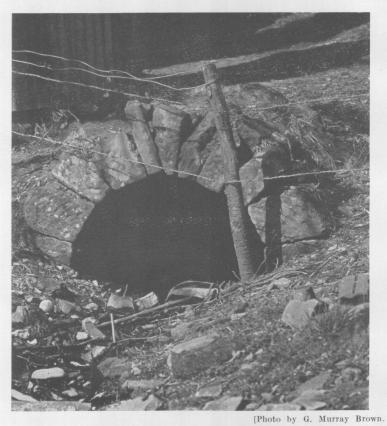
Plate III.—HALF-CHOKED OUTFLOW FROM TUNNEL AT POINT A. ON PLAN
